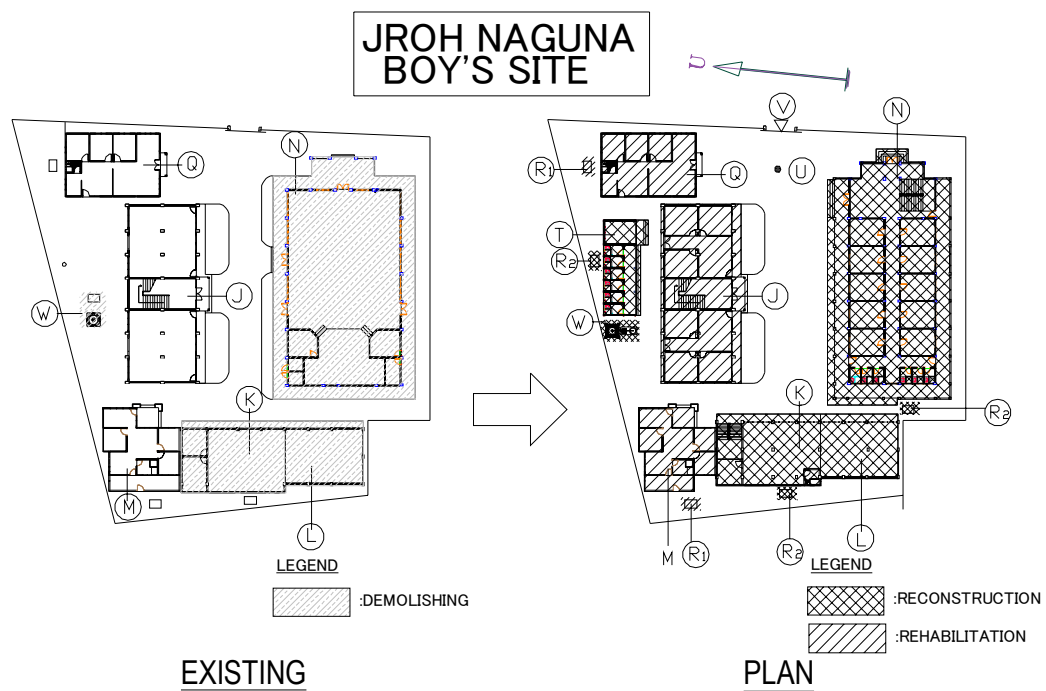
Site Plan and Rehabilitation Plan for Jroh Naguna Orphanage (Boy's Site)
